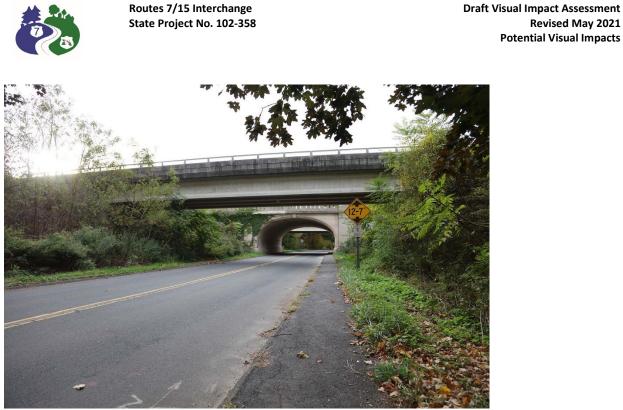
Key View #16 – View Looking South on Perry Avenue - Proposed View for Alternative 26
